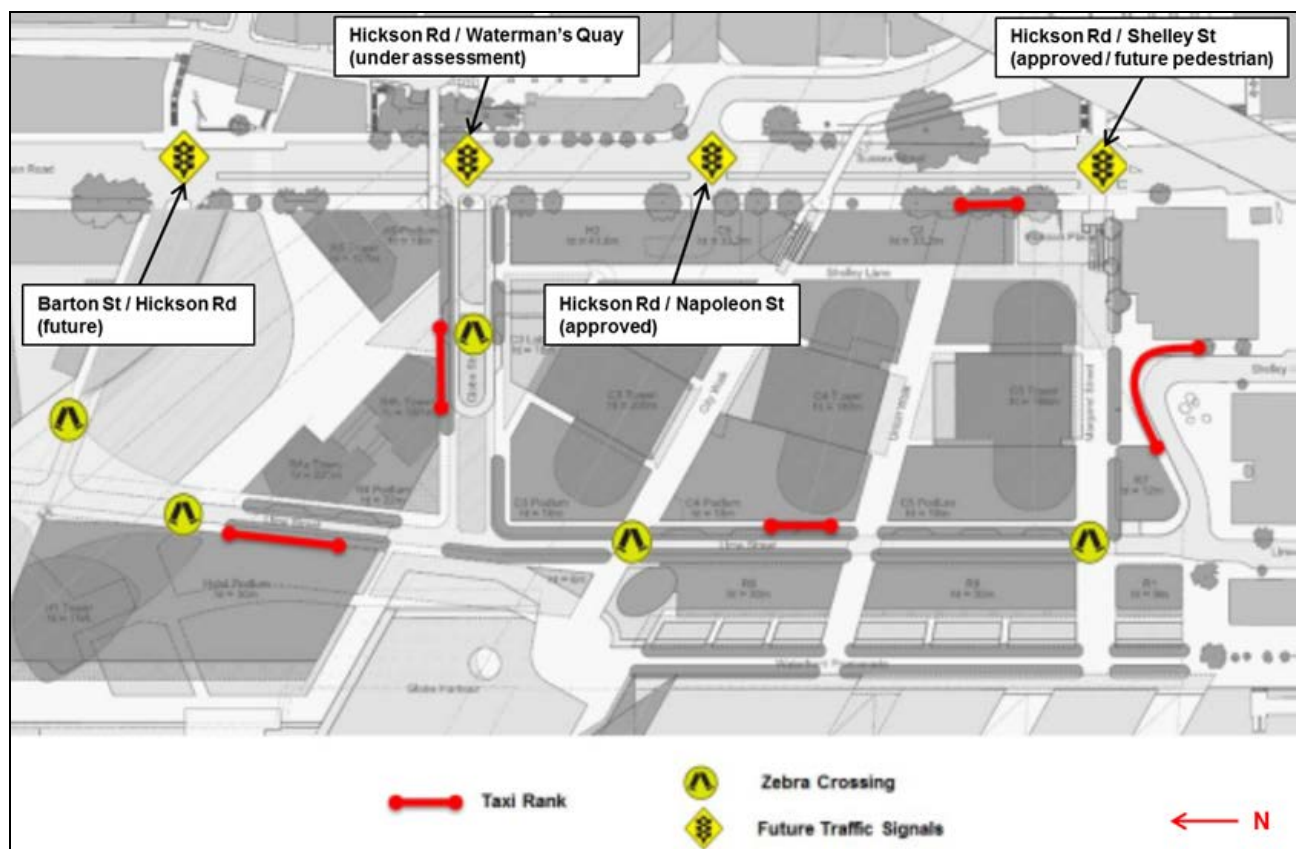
Approved and proposed signalised intersections at Barangaroo South (Source: Arup)
